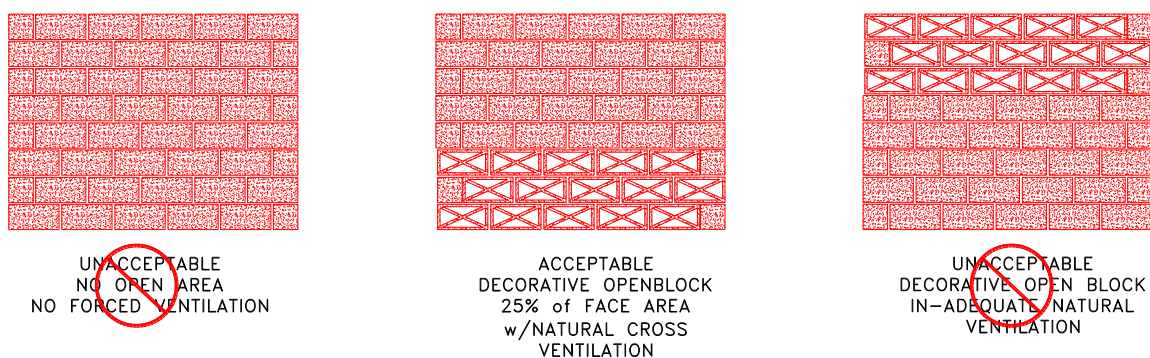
Outdoor walls or courtyards for carbon dioxide installations
